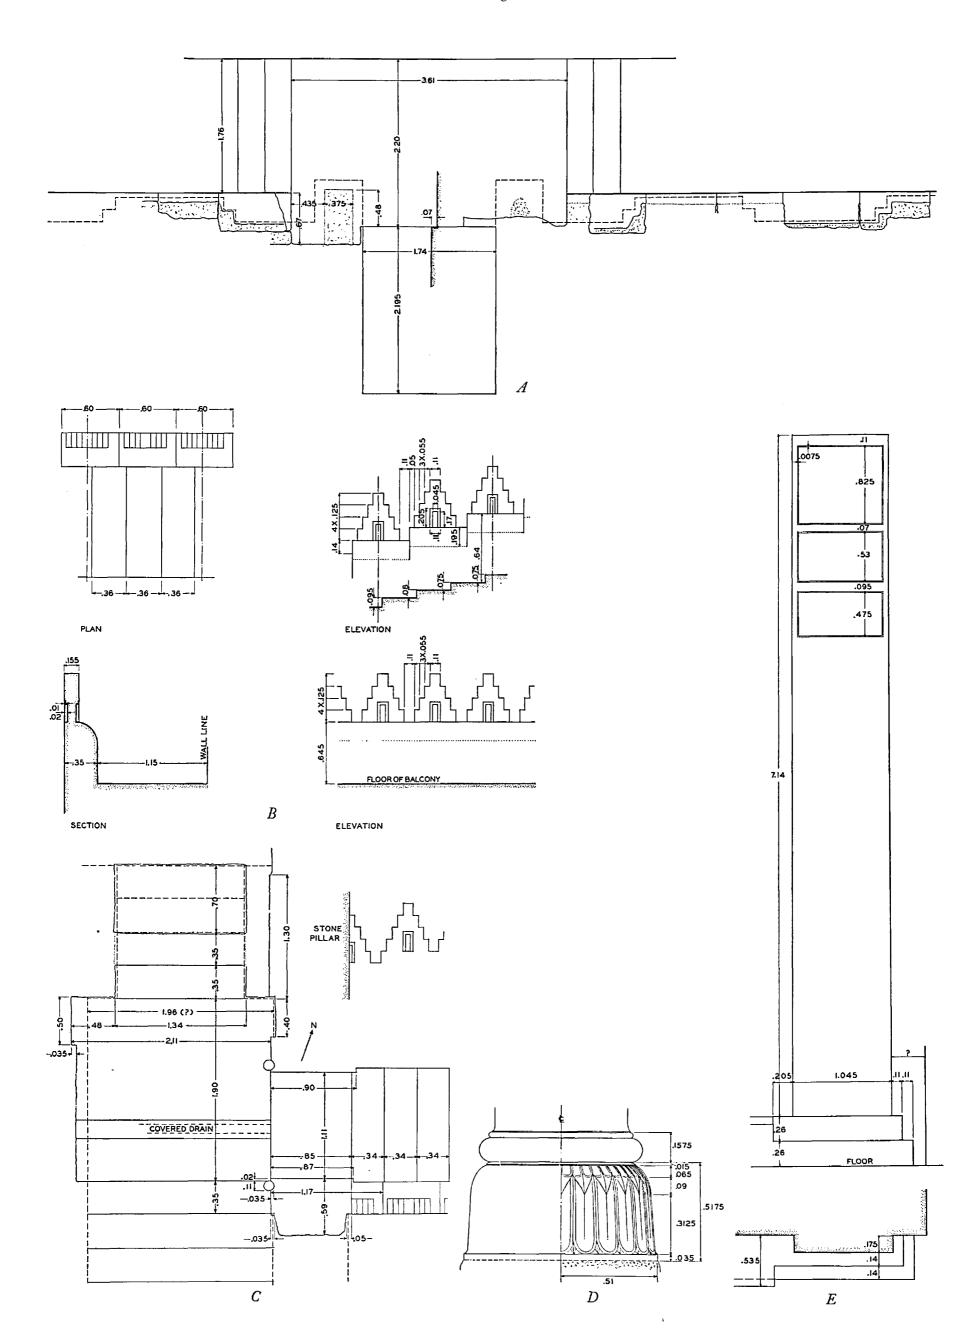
Palace of Xerxes. A. Reconstructed Plan of Wall at Western Stairway. Scale, 1:50. B. Portions of Southeastern Stairway and of Balcony Parapet. Scale, 1:40. C. Intermediate Landing of Southwestern Stairway. Scale, 1:40. D. Reconstructed Northeastern Column Base of Room 9. Scale, 1:20, E. Western Anta of Portico. Scale, 1:40
